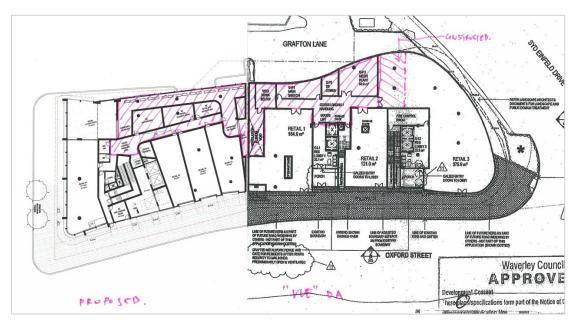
Ground level plant room comparison between the proposal and 'The Vue' on the immediately adjoining eastern allotment (Source: UP Architects/Kann Finch)
